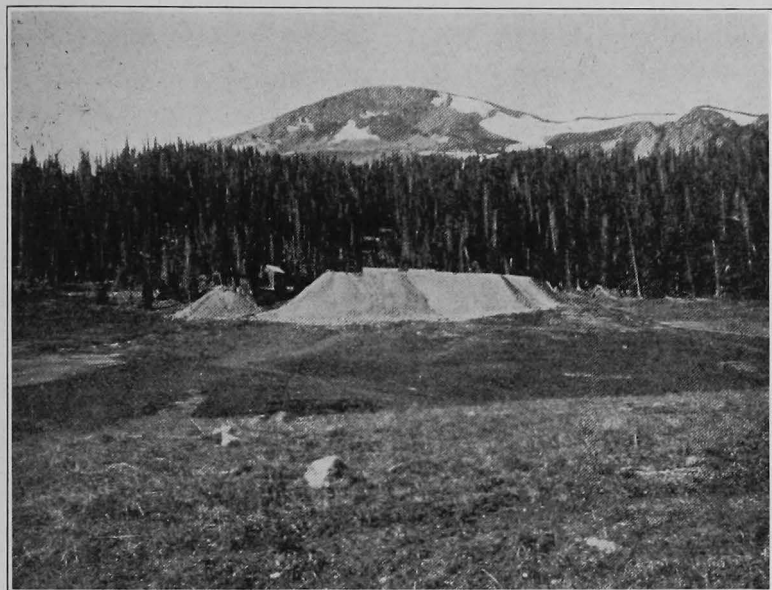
Dump at portal of the Golconda cross-cut tunnel, with South Mountain in the background.
